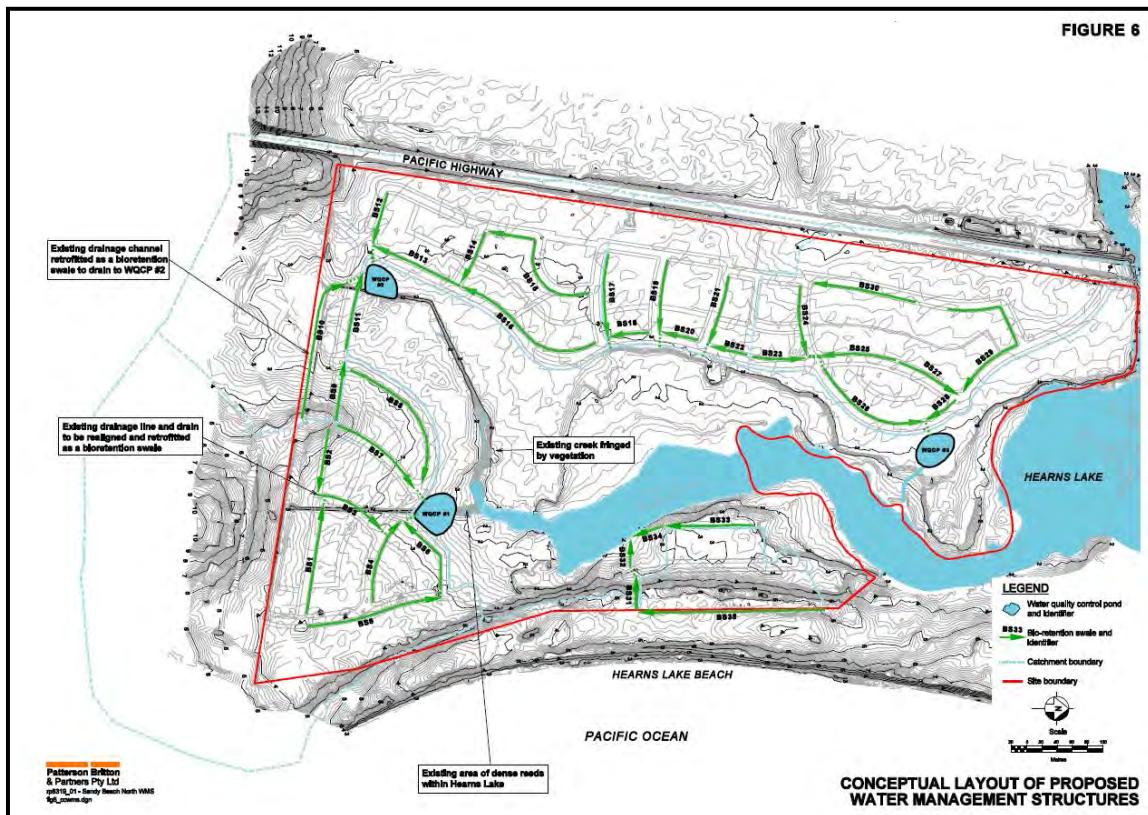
Conceptual Layout of Proposed Water Management Structures.
